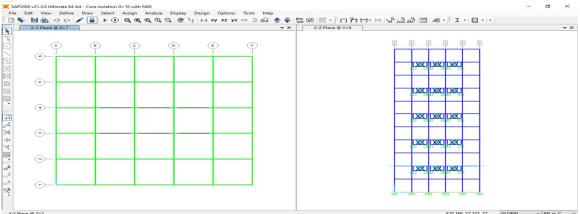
Plan and Elevation of G+10 storied RCC Core Isolated structure
